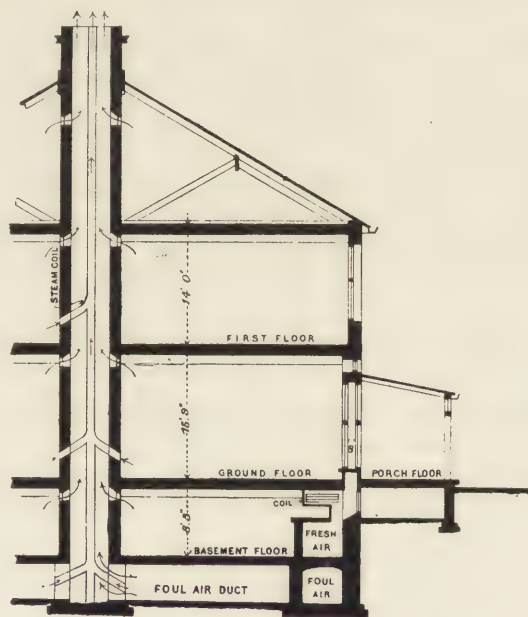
SECTION THROUGH CHILDREN'S WARD, PRESBYTERIAN HOSPITAL. [See Plans, Illustr. x.]
